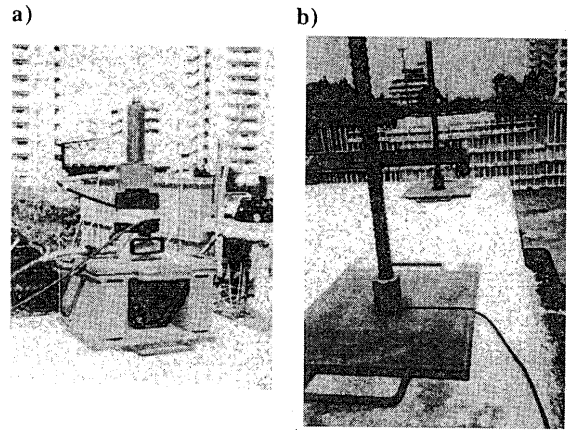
a) Jack system for preloading and b) nut system for prestressing (pier)
